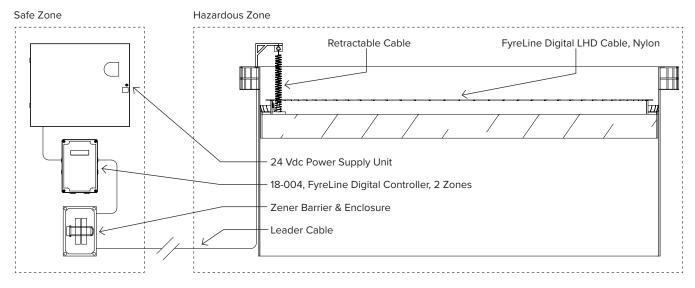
Retractable Cable with Cable Collector Wiring Layout
